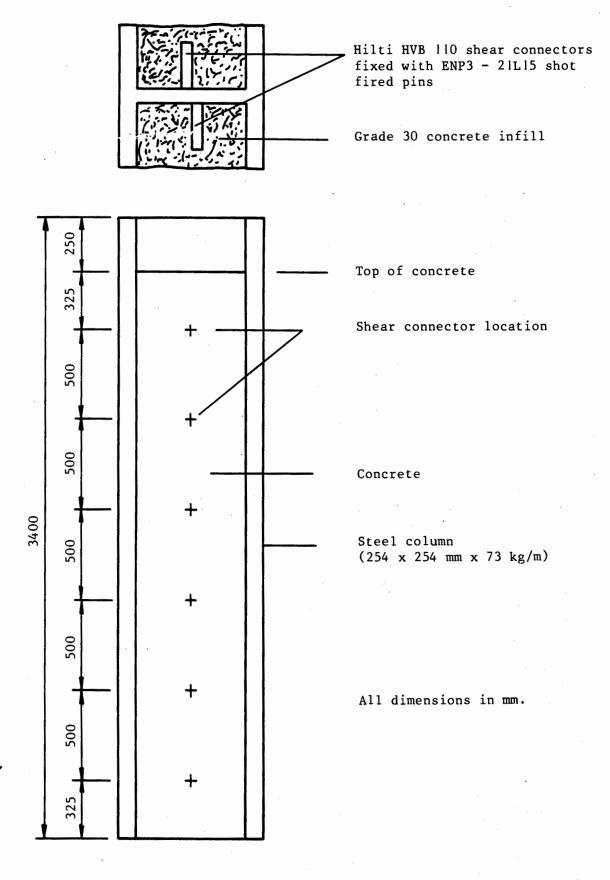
DETAILS OF HILTI SHEAR CONNECTOR LOCATIONS AND CONCRETE INFILL - TEST NO. TE 7381
